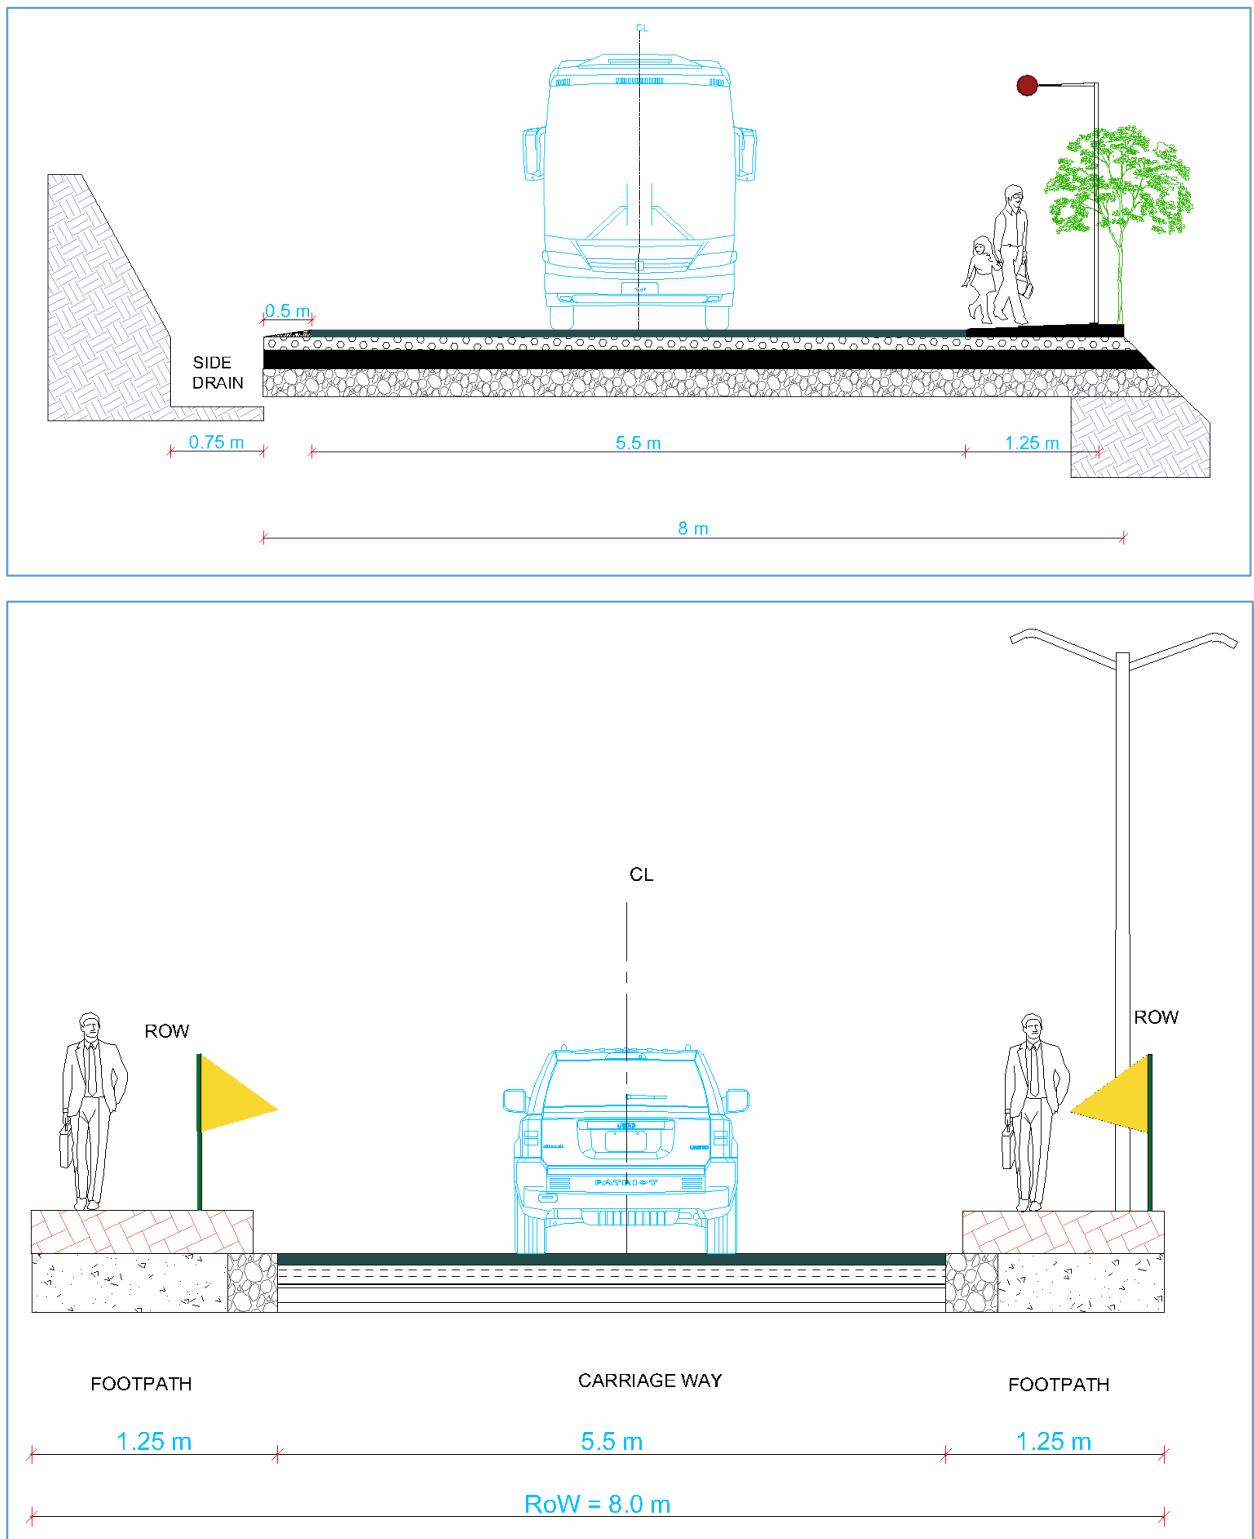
Typical Cross Section of Collector Road (Class C)
